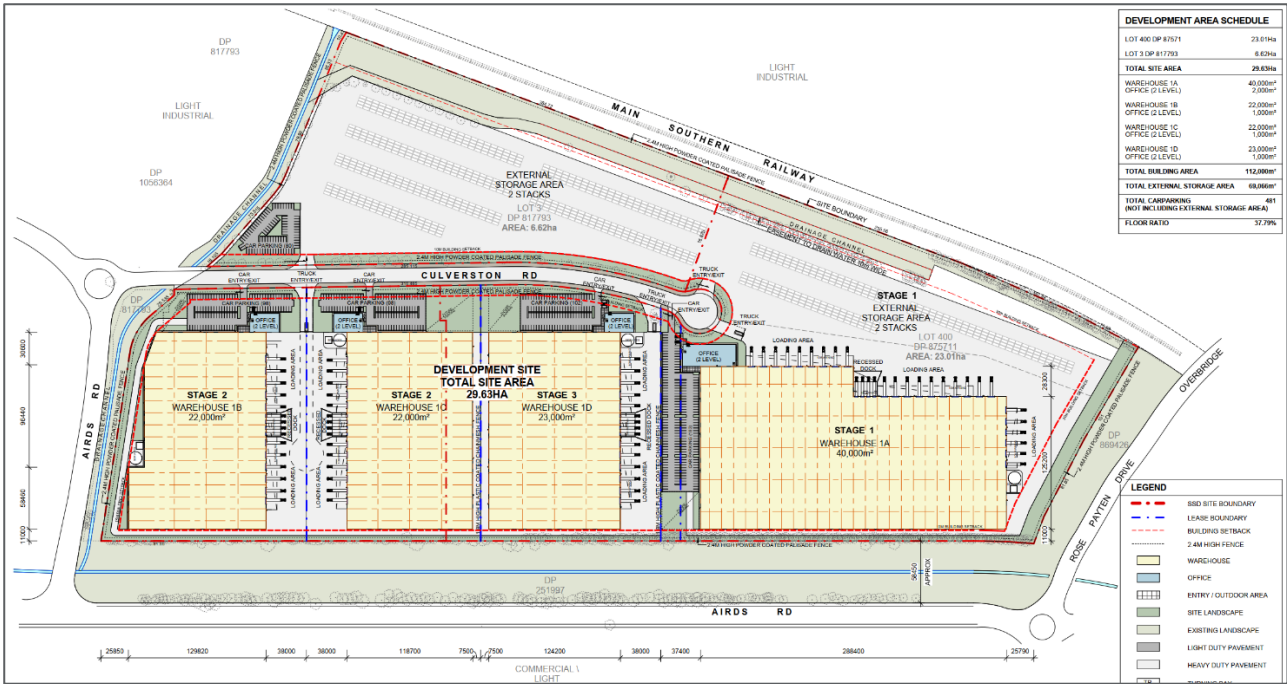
Approved Architectural Site Plan (drawing 116101_A-SSD_A0006, issue 9, by Reid Campbell, dated 29/02/2017)
